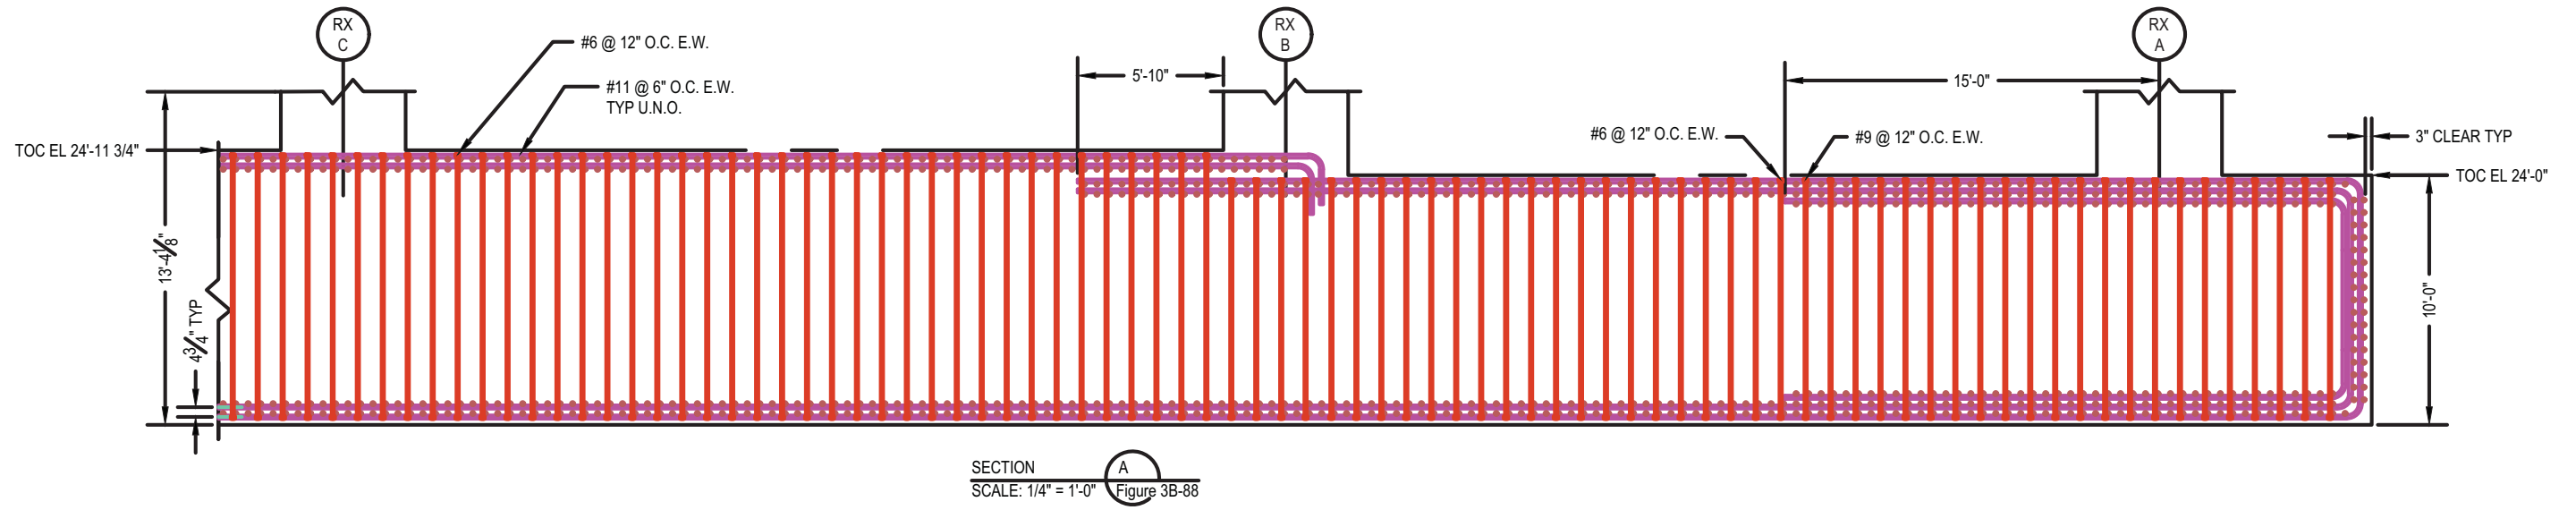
B-88: Reactor Building Reinforcement Plan of Basemat Foundation
